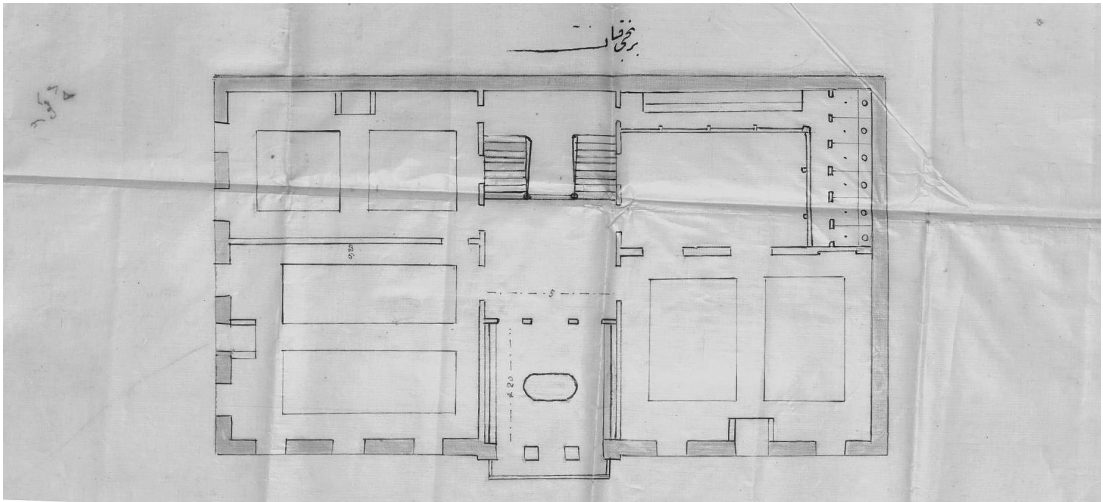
Drawing plan of the ground floor; BOA., İ.AZN., 4033, leaf 3.
